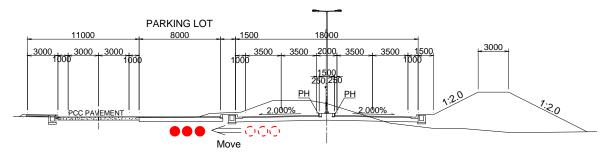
General settlement plan for Engineering & technical lines and networks in Baruun Teevershid street
